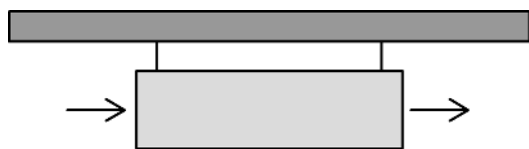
Under ceiling mounted I-Type (with / without casing/false ceiling)
